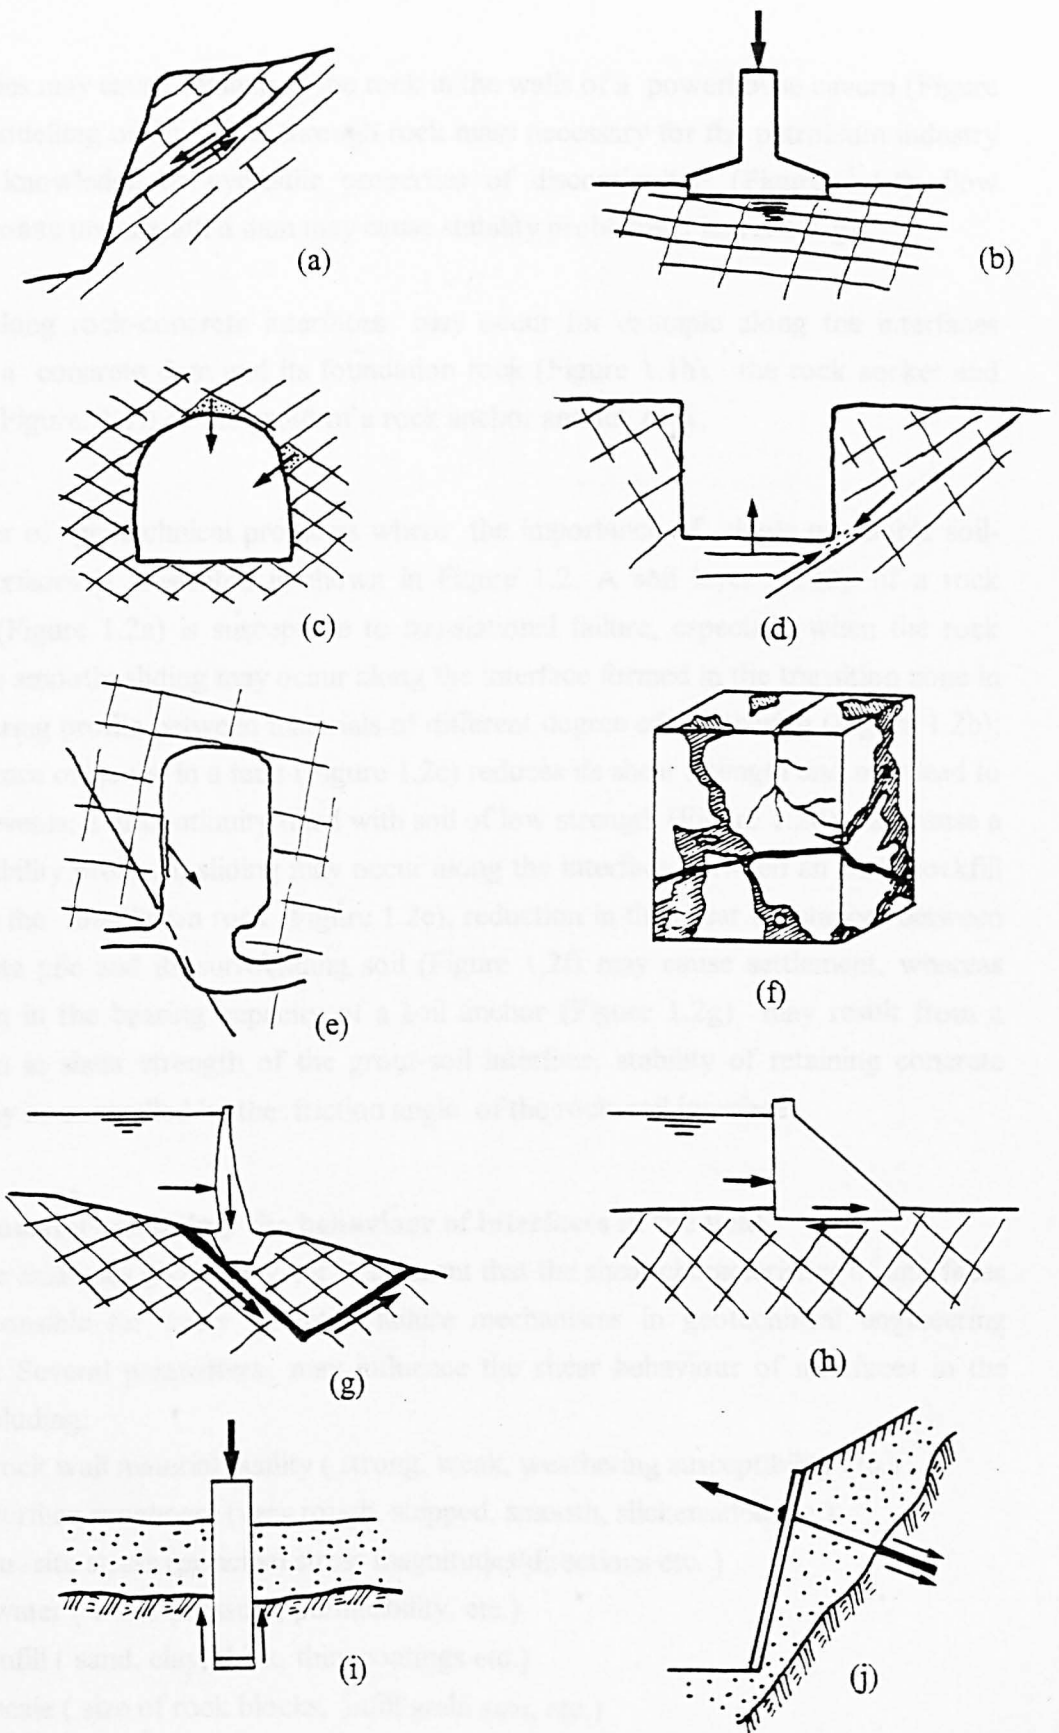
Typical examples illustrating the influence of rock-rock and rock-concrete interfaces on rock engineering projects: (a) slope stability; (b) foundation on rock; (c) underground excavation; (d) surface excavation; (e) hydroelectric power cavern; (f)-(g) fluid flow through joints; (h)-(j) concrete - rock interfaces
